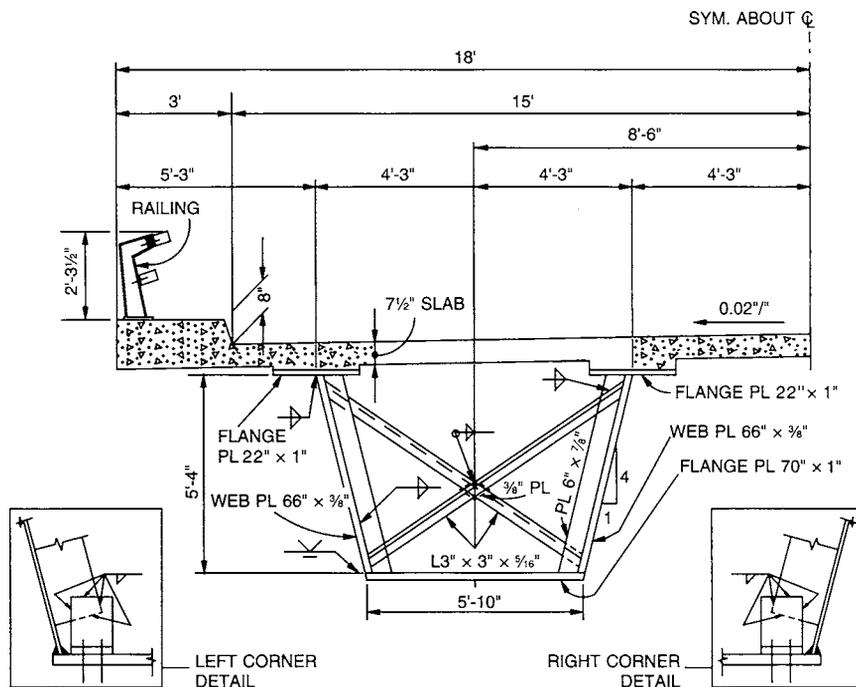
Half cross section of composite box girder with 120-ft span.
